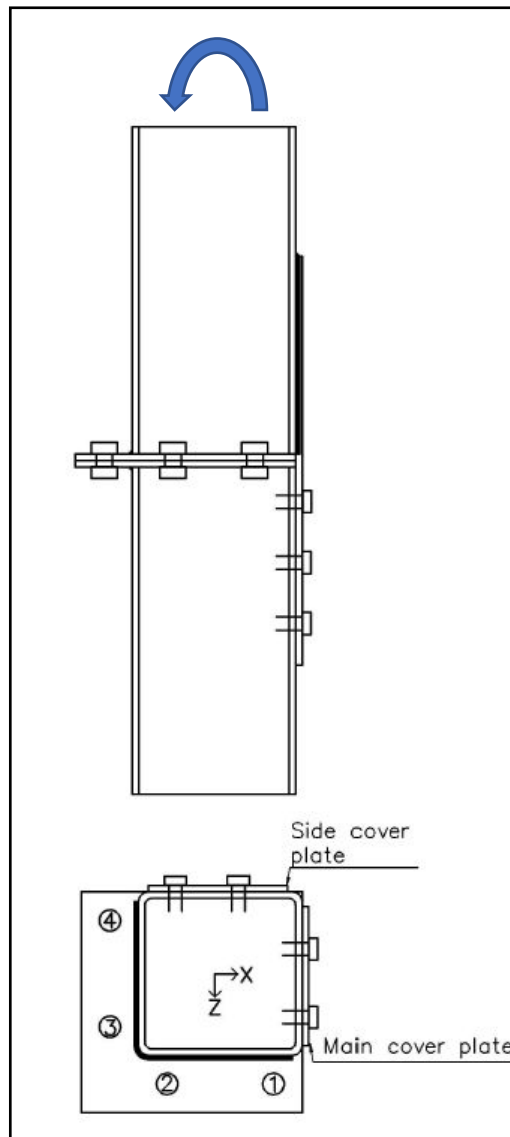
Plan and elevation of specimen CC-1 (case 2)
